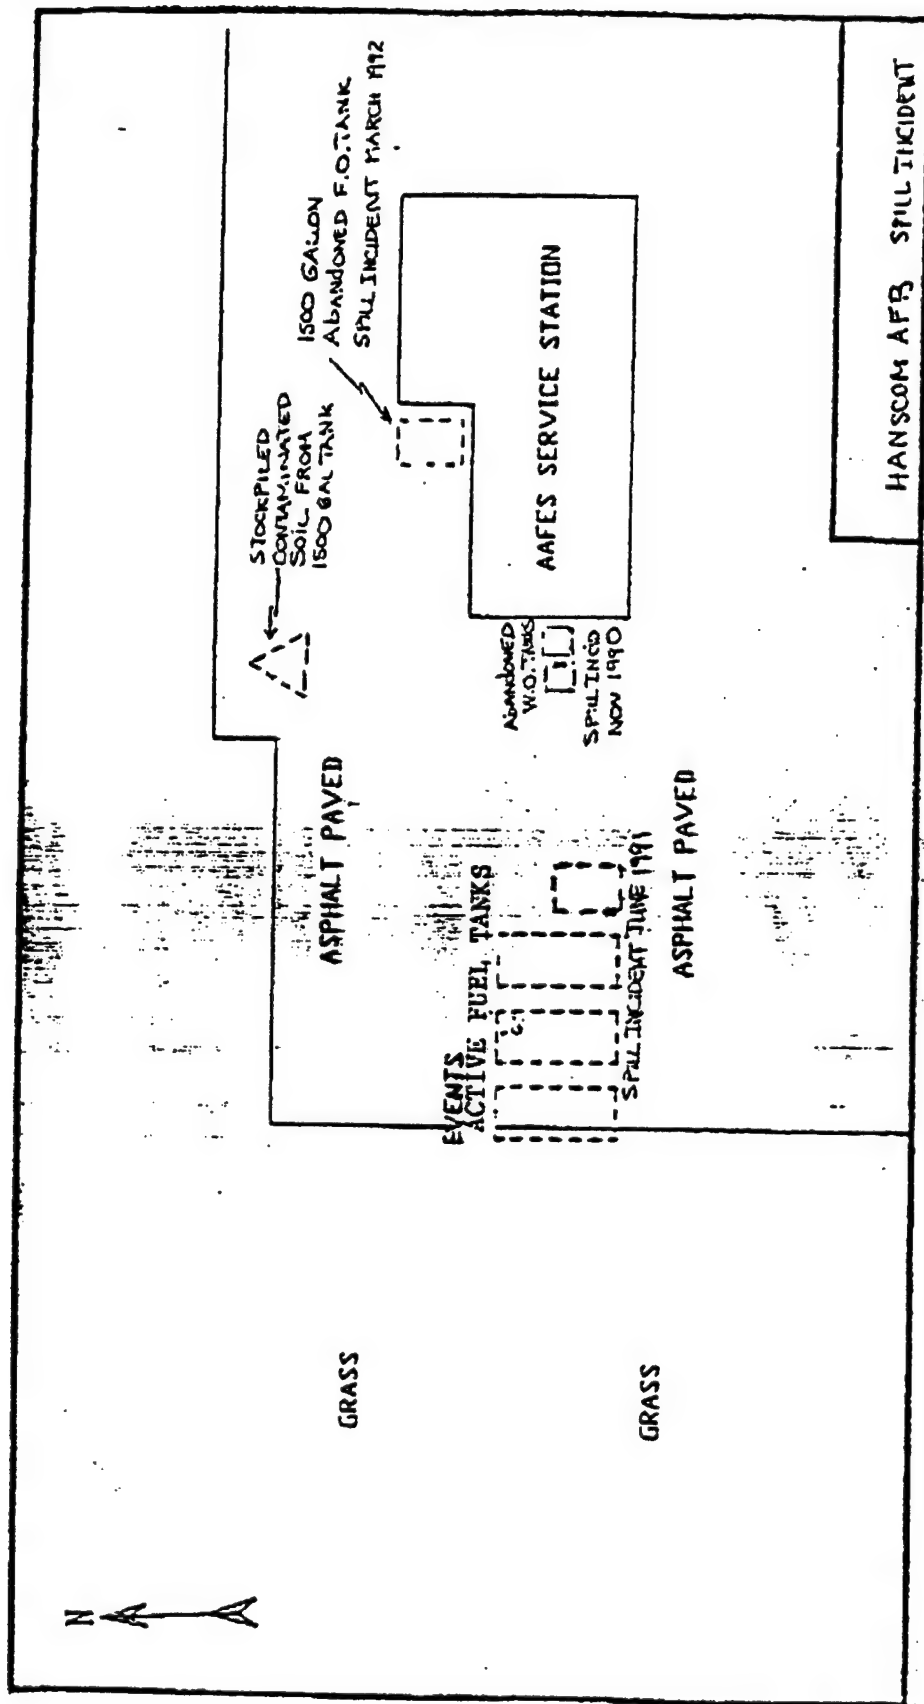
SITE DIAGRAM FOR BUILDING 1639
